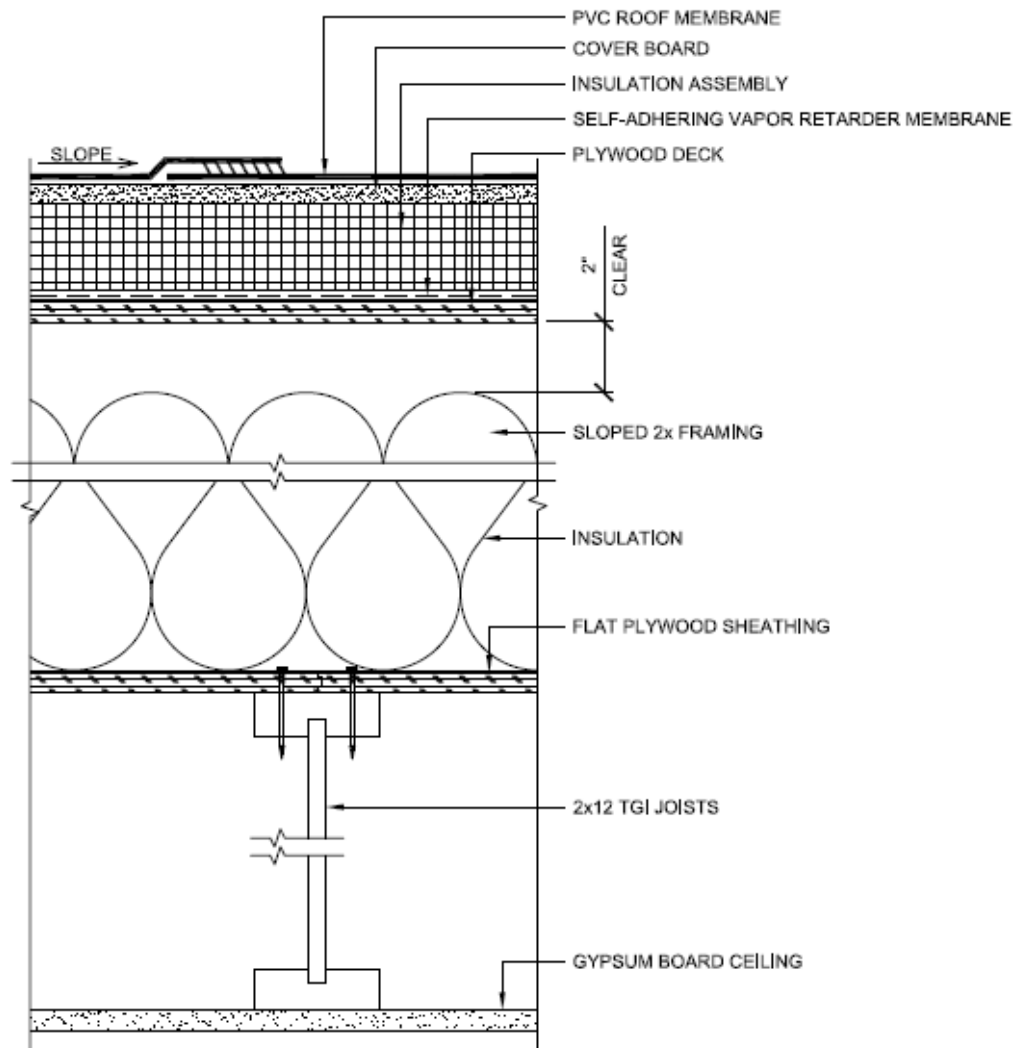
Vapor Barrier Placement on a Wood Double-Framed Deck
